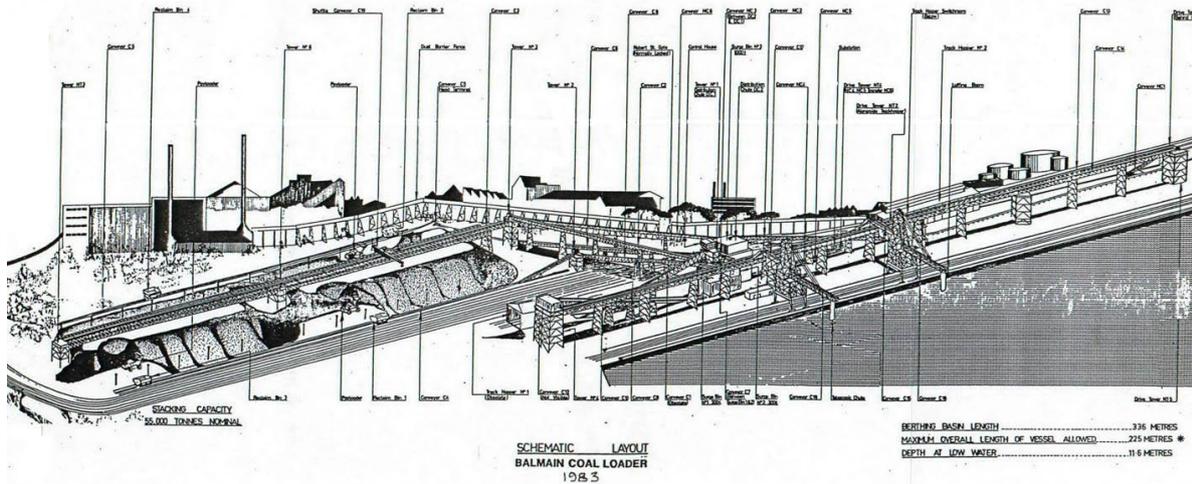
Schematic diagram showing the 1963 shiploader and coal loading facilities replacing the 1953 coal loading facilities Source: Fenrick
